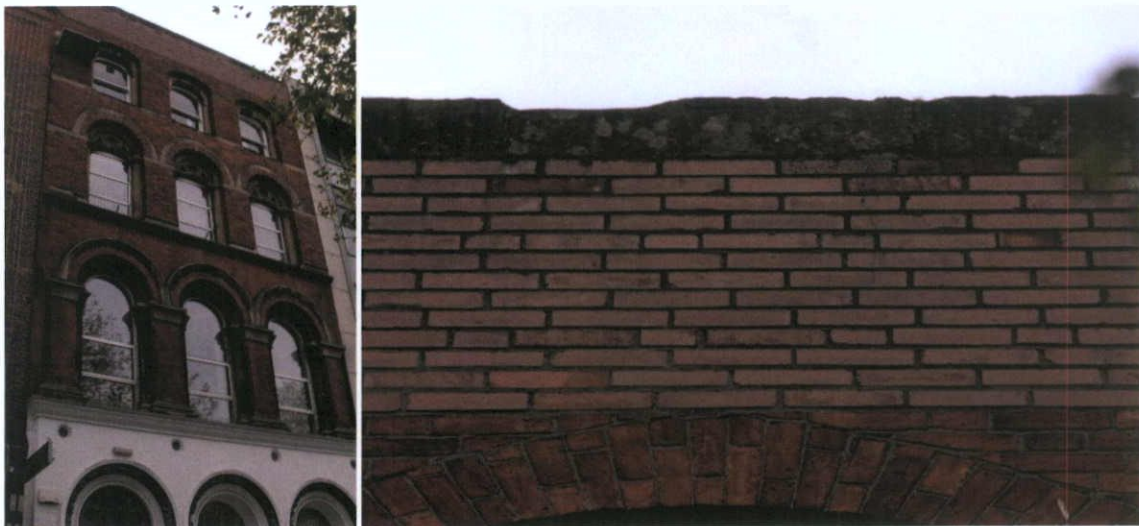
Façade of 60 O'Connell Street with a detail showing the more recent mid-to late twentieth century brick at parapet level; with repointed nineteenth century brickwork seen below.
